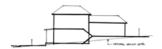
Stepping of Building on Steep Site (i.e. remove)
